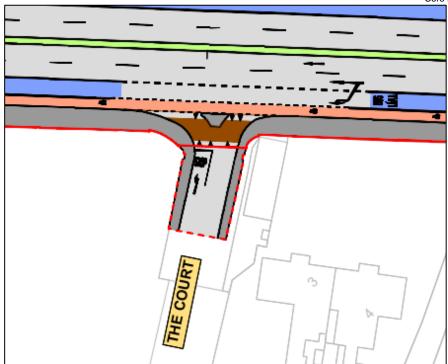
Extract from General Arrangement Drawings (Sheet 09)
